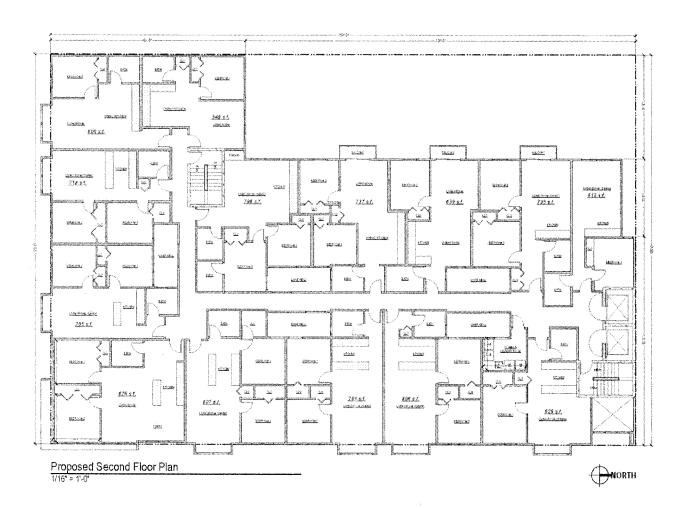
Second Floor Plan 480 Potrero Avenue Source: Sia Consulting, August 2012
